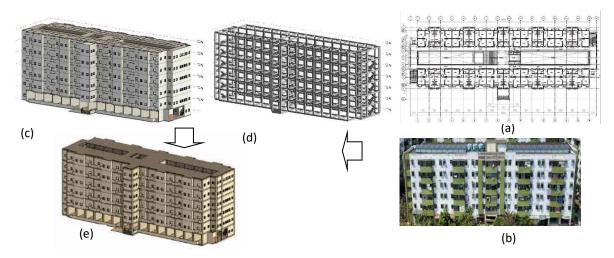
3D BIM modeling process, floor plan drawing (a), picture of the case study building (b), 3D BIM architecture model (c), 3D BIM structure model (d), combined 3D BIM model (e).
